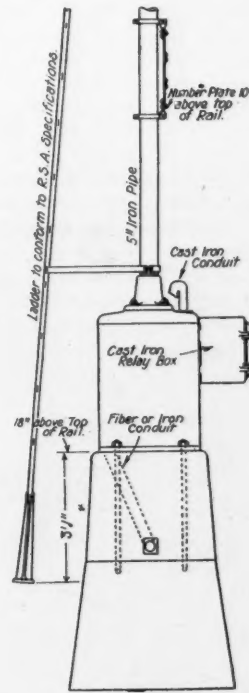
Automatic Block Signal on Concrete Foundation Showing Arrangement of Details.
